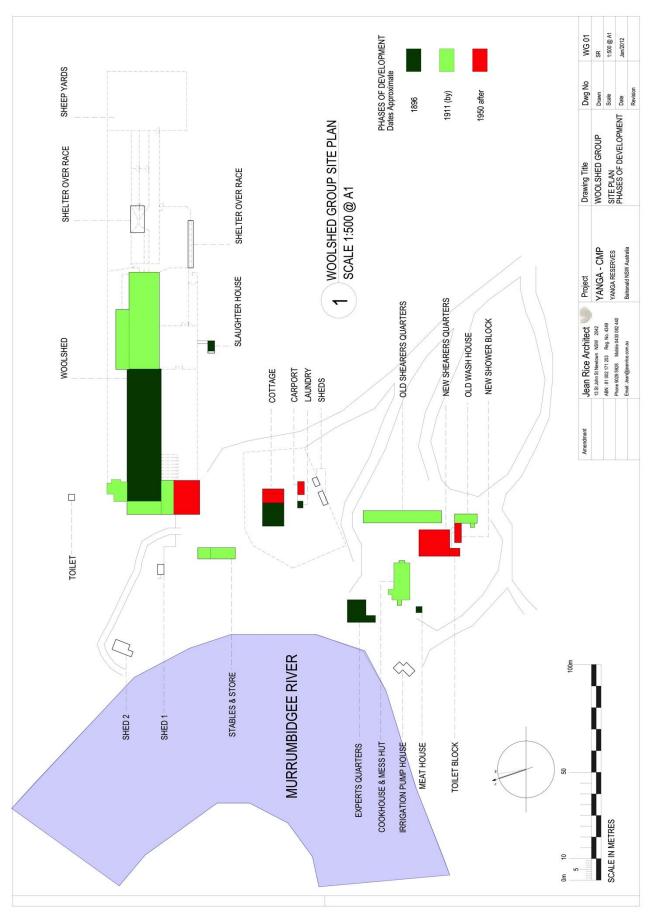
Woolshed Group site plan showing phases of development. Jean Rice Architect, site assessed 2009.
